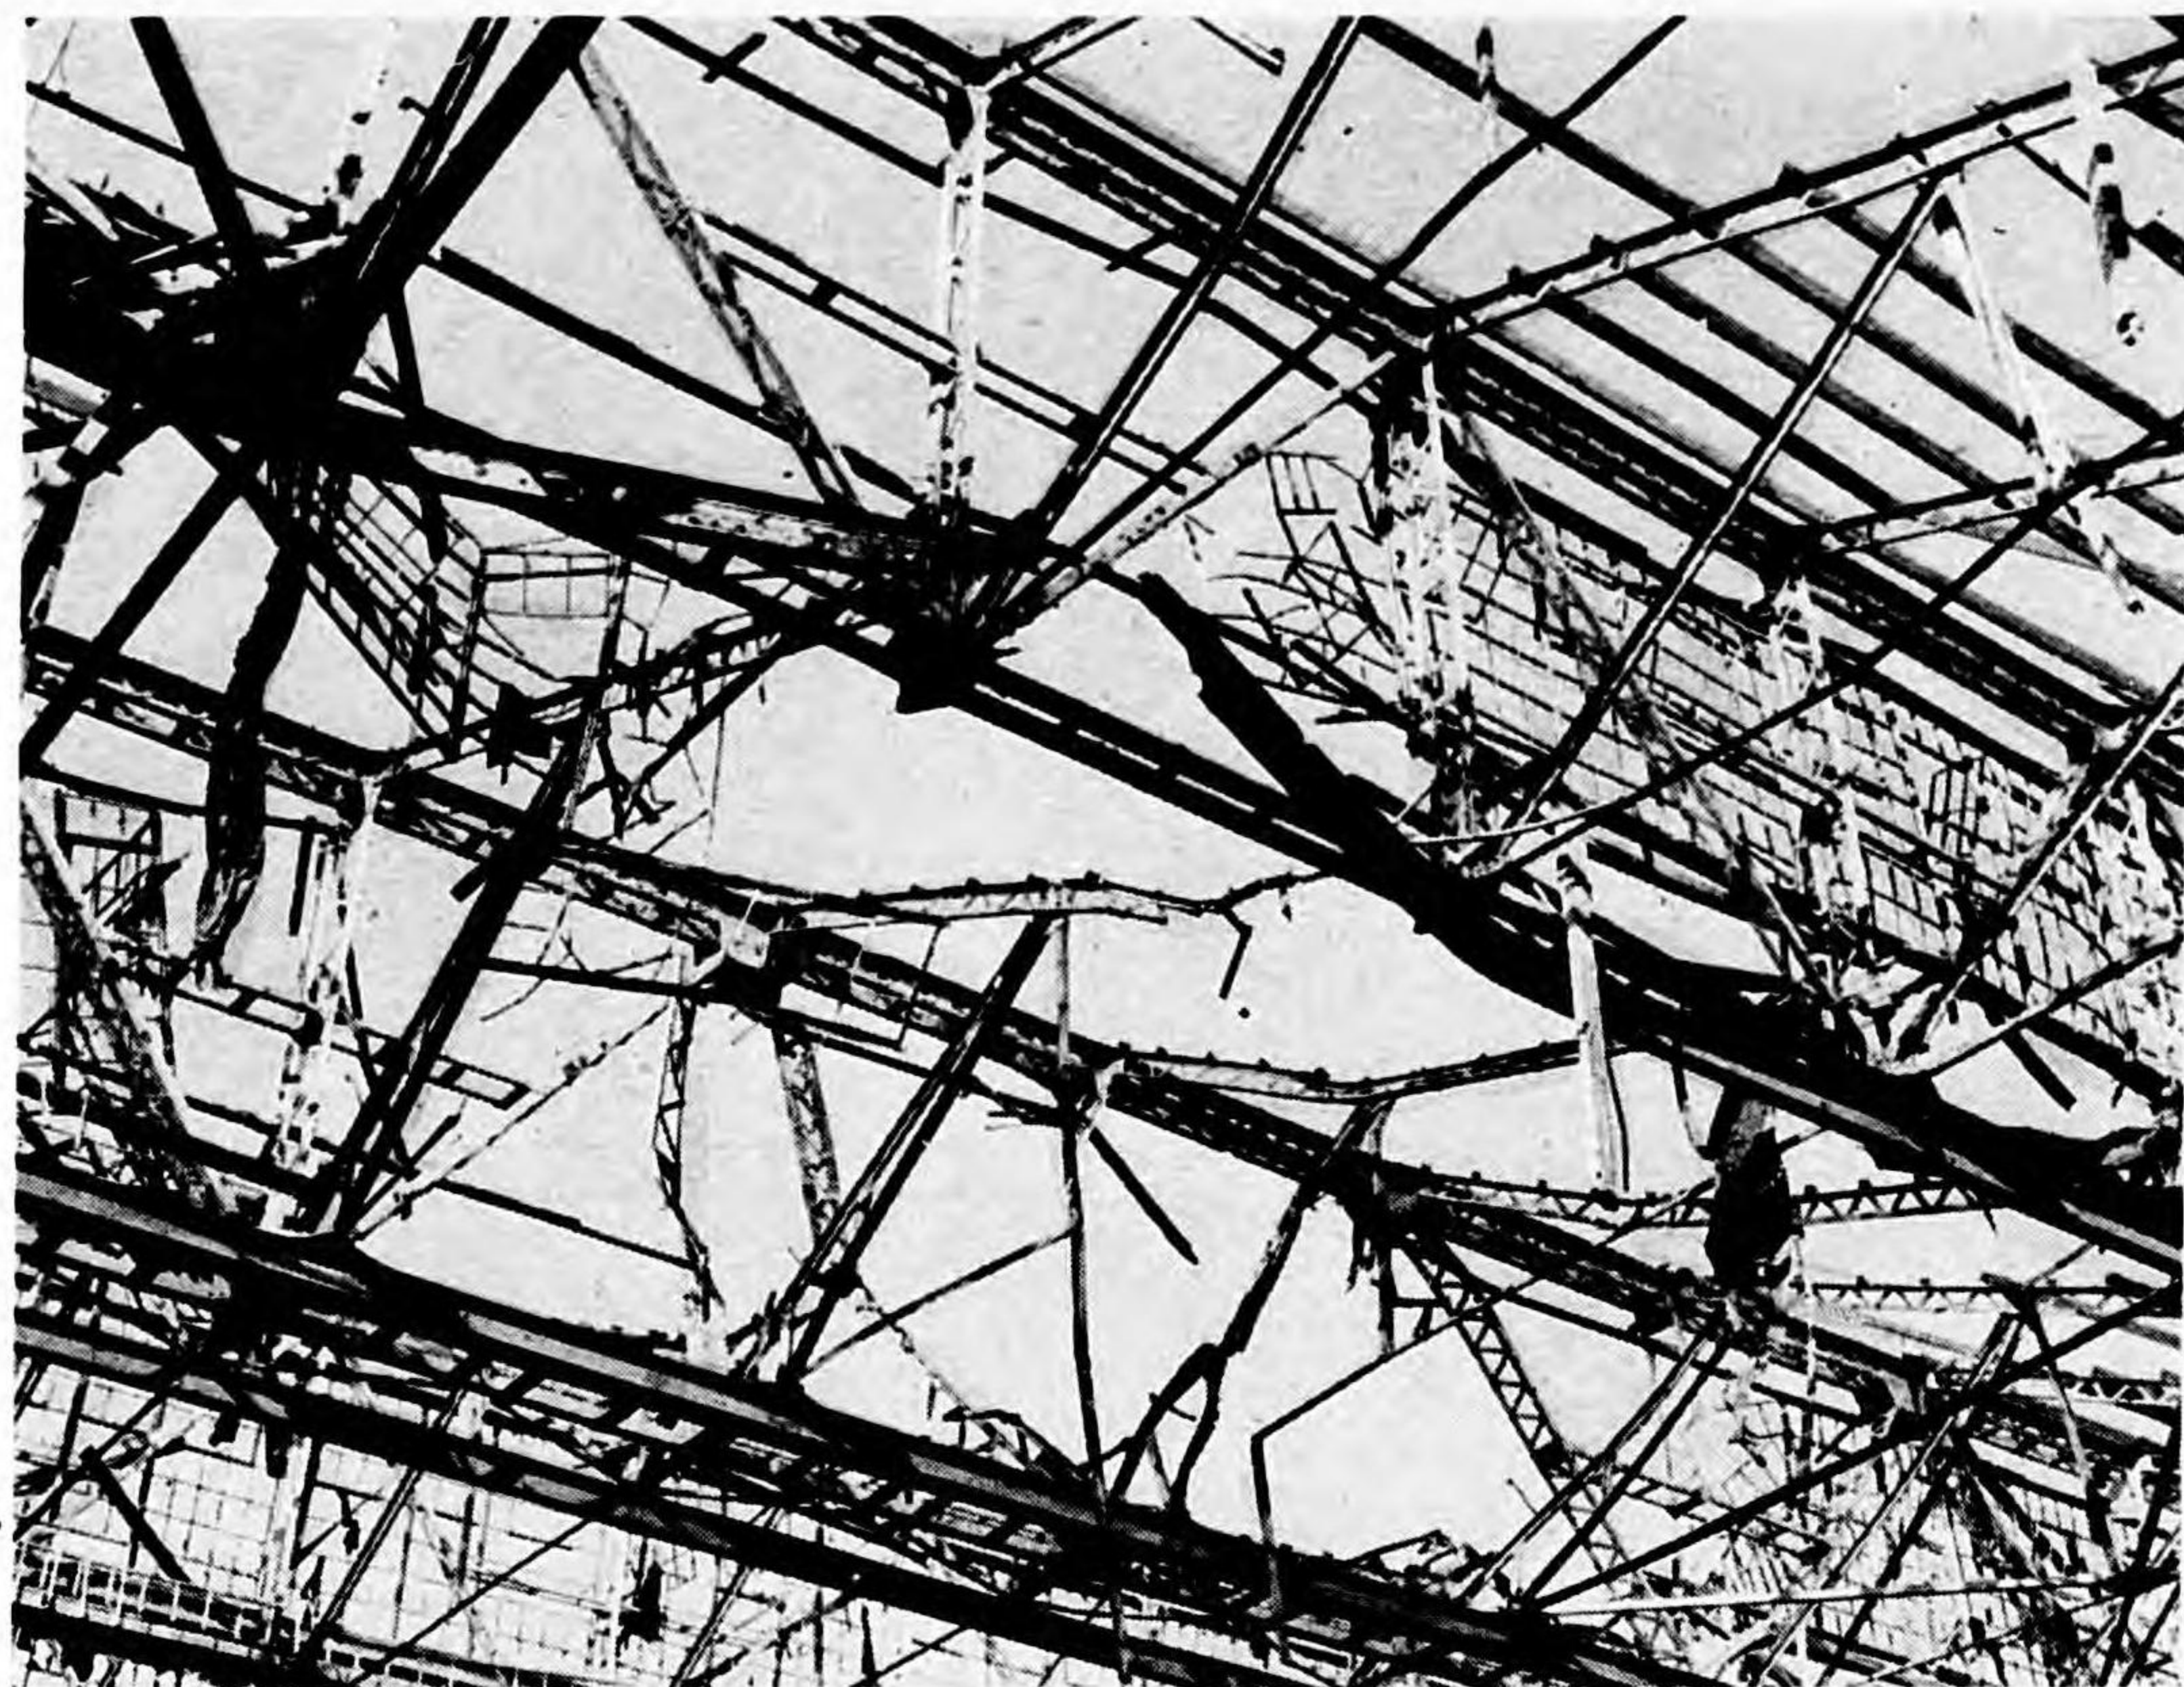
Building 1, Bomb 2; damaged roof steel.
